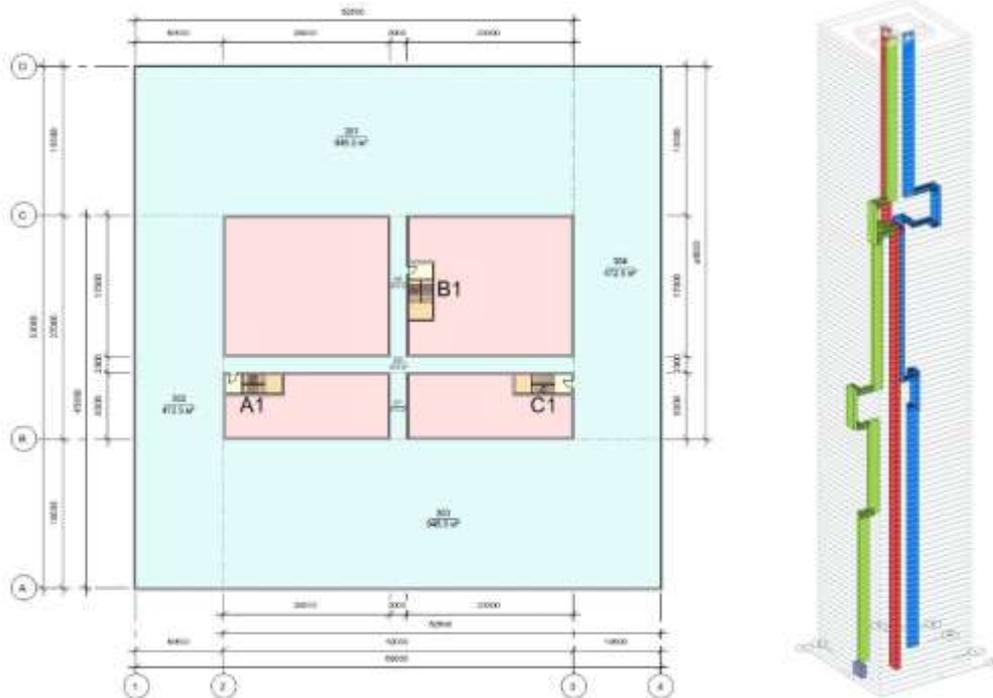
example 2 Revit BIM model (left) typical floor plan (right) staircases 3D view
